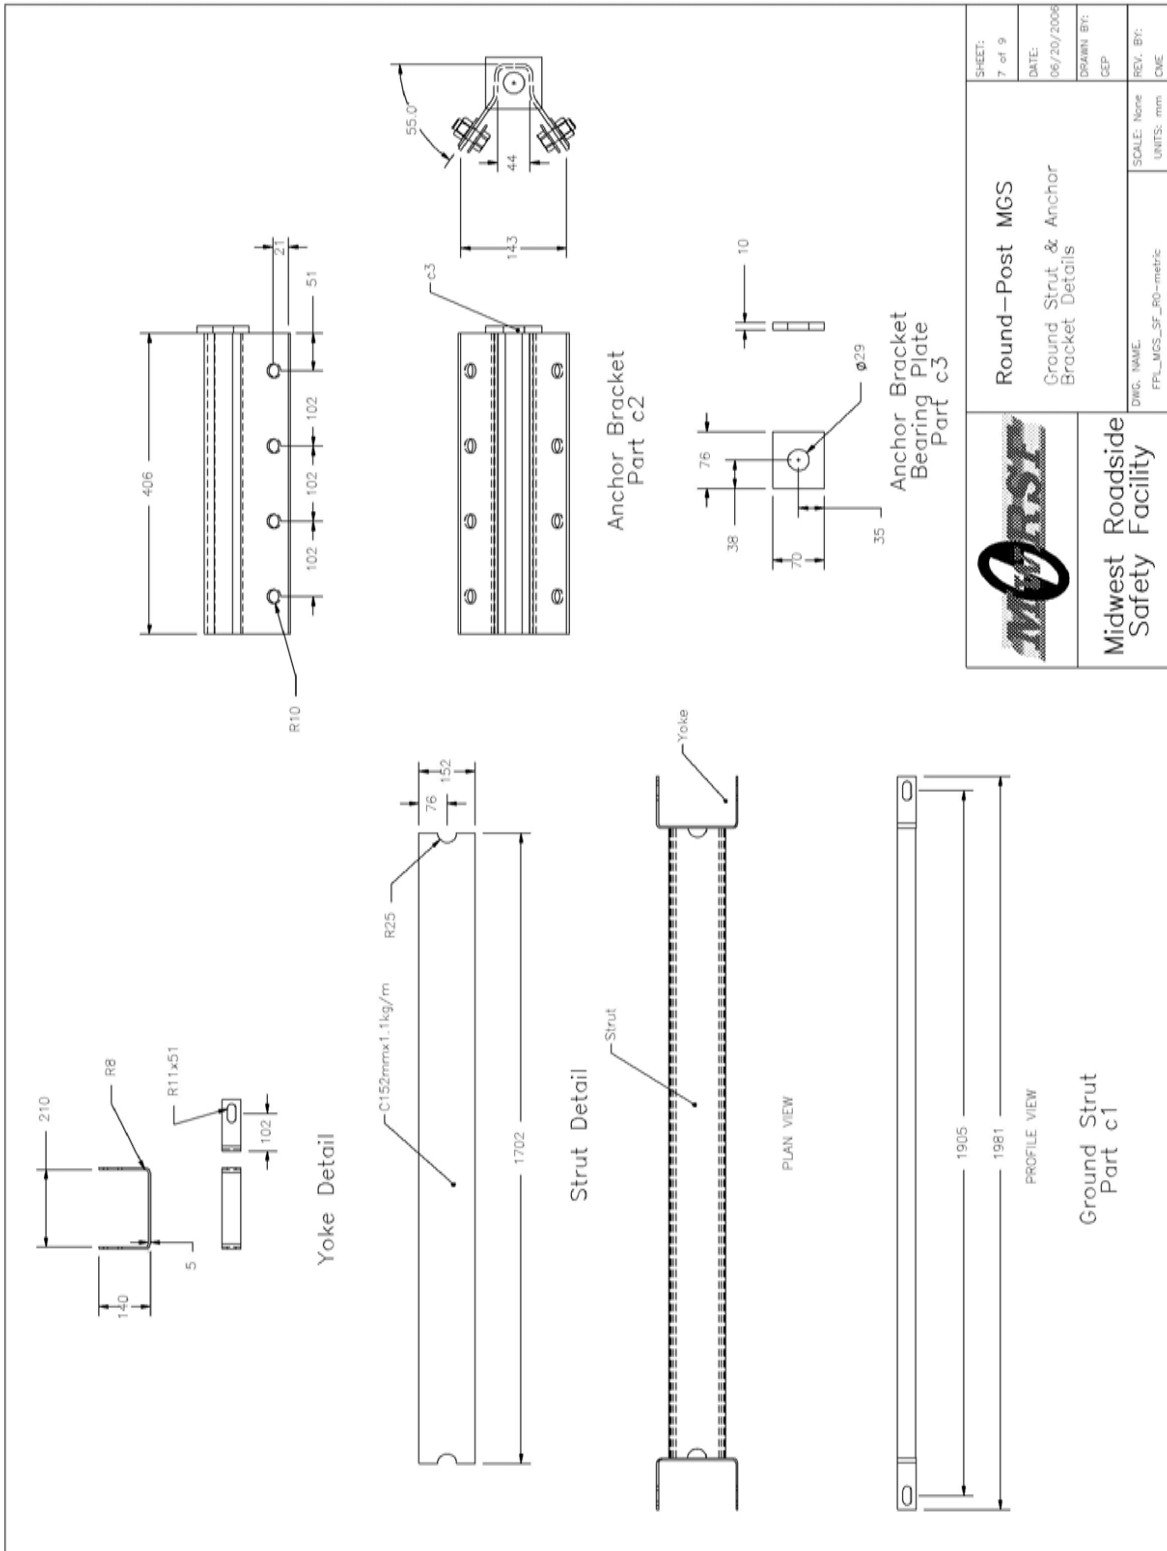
MGS Round Post Southern Yellow Pine Details – Ground Strut and Anchor Bracket Detail
